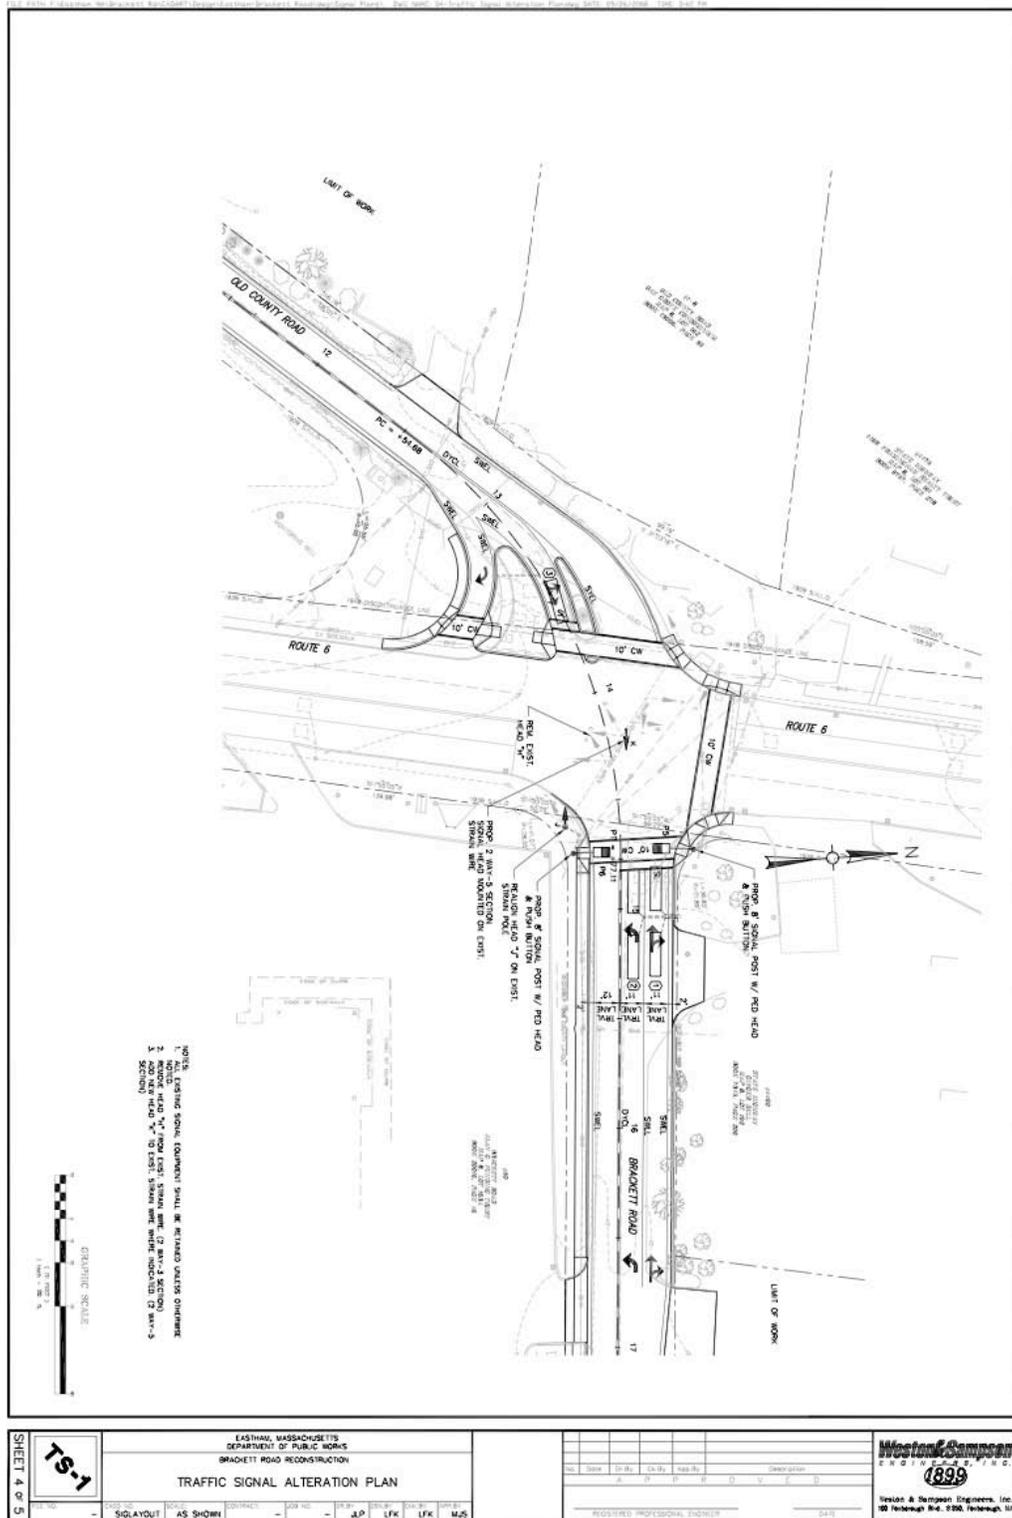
Brackett Road Improvements - Route 6/Brackett Road/Old County Road
